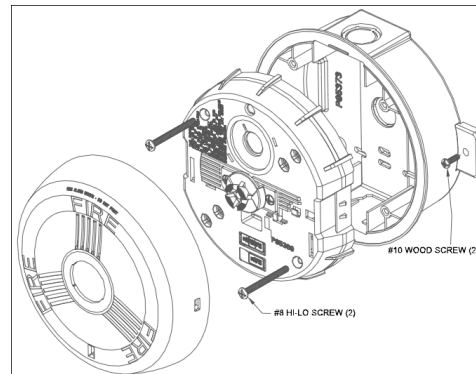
Ceiling Horn Strobe with LSPKBBC Surface Mounting Box
